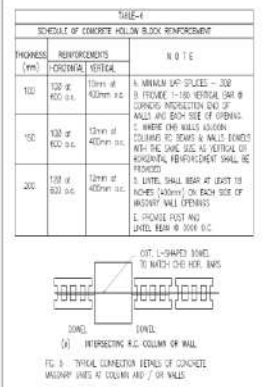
TYPICAL CONNECTION DETAILS OF CONCRETE WALL REINFORCEMENT
